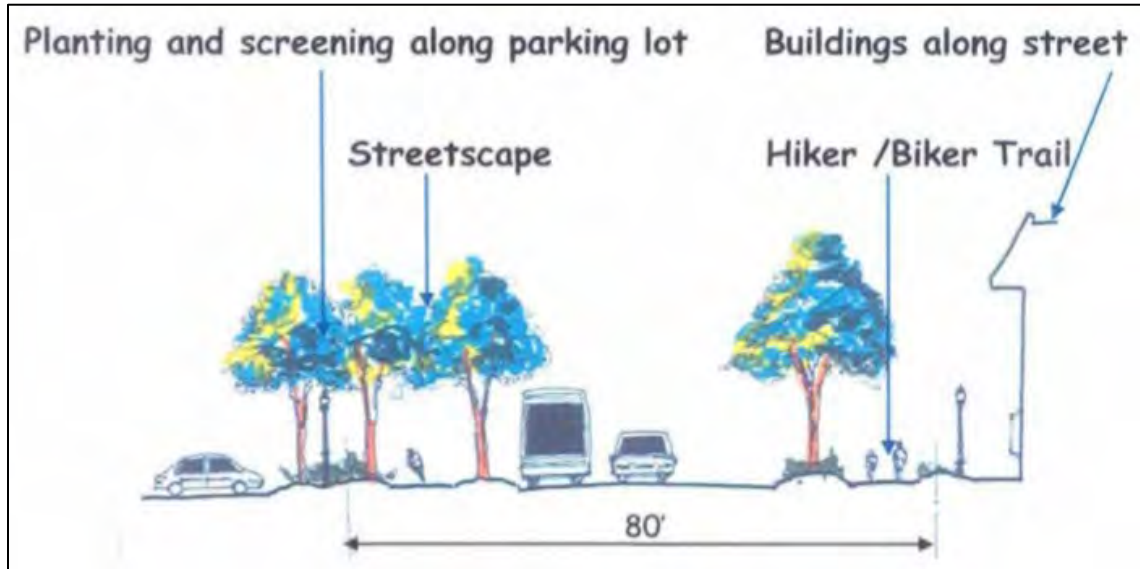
Master Plan Proposed Streetscape – Seneca Road (curb and gutter)
